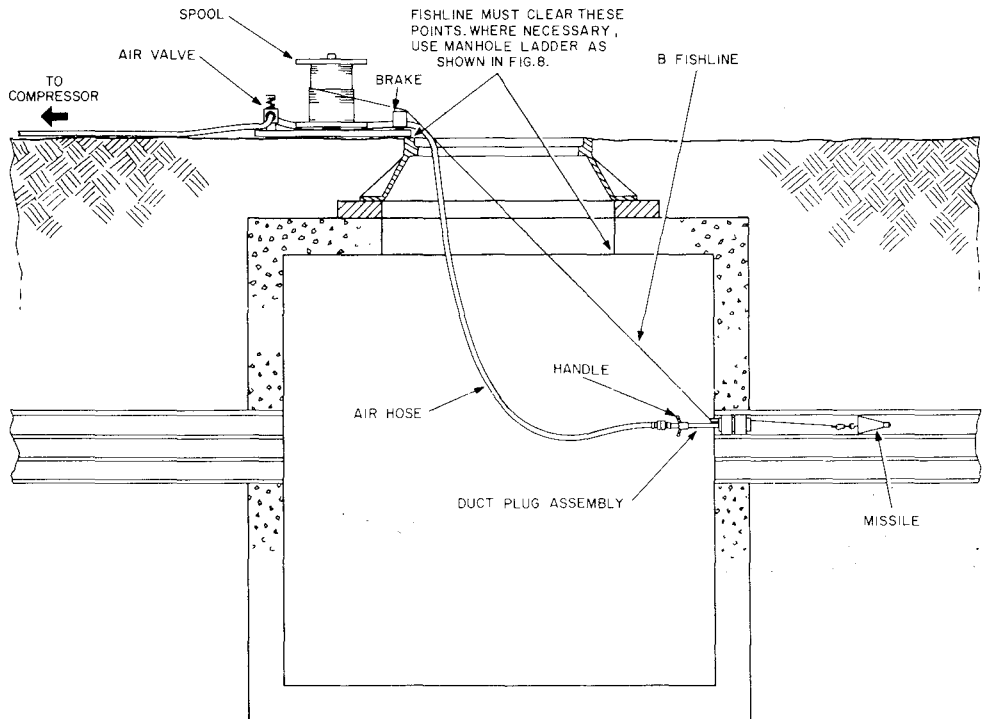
Duct Plug Assembly in Duct—Using Spool
